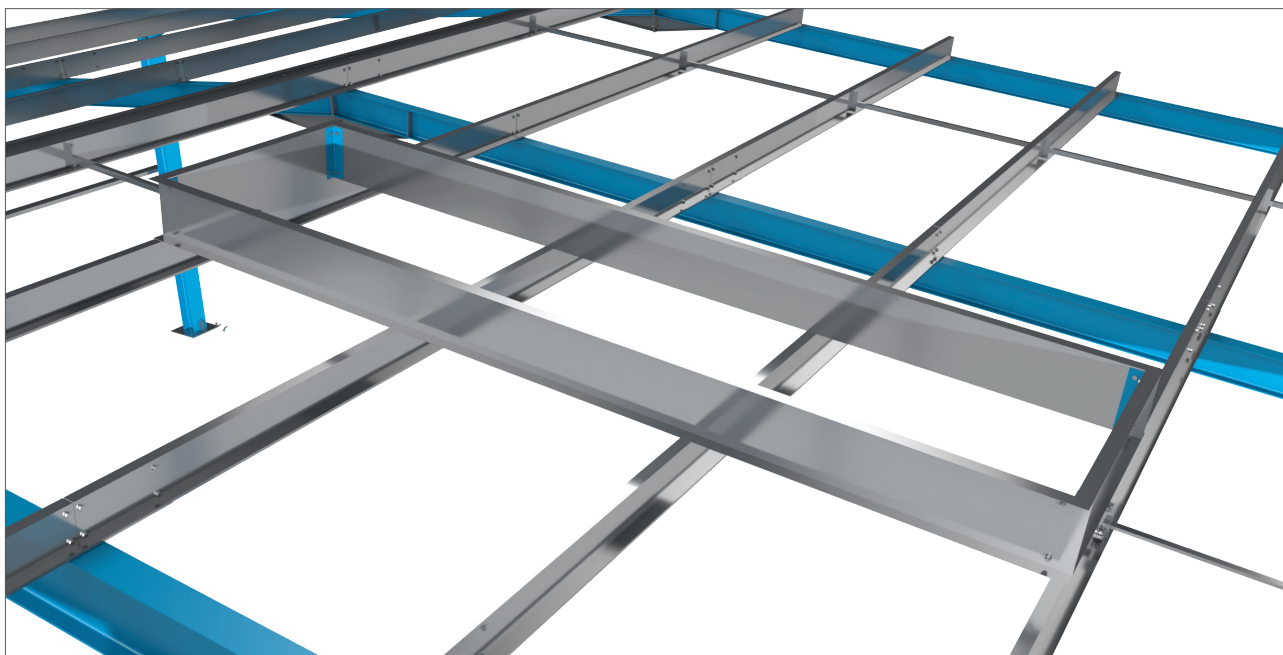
Structural arrangement of a skylight frame positioned perpendicularly to the purlins
